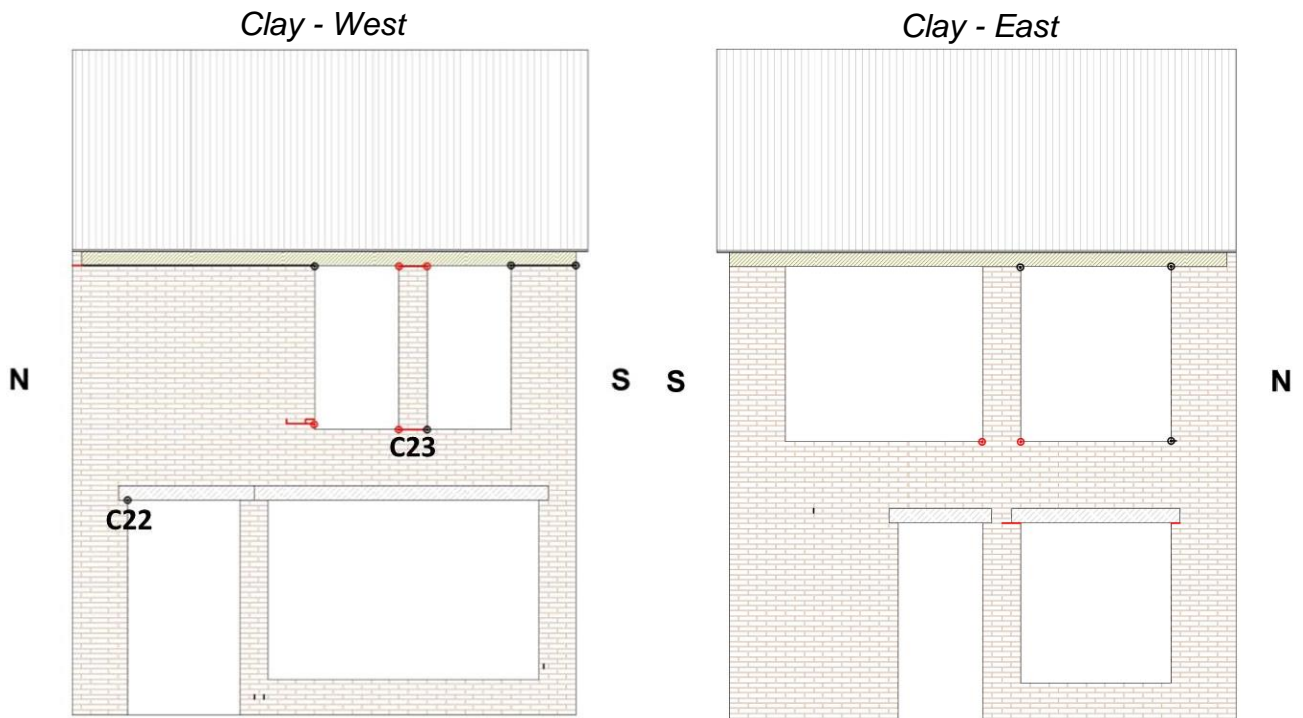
EQ-NPR 66% cracks – West and East clay façade.
